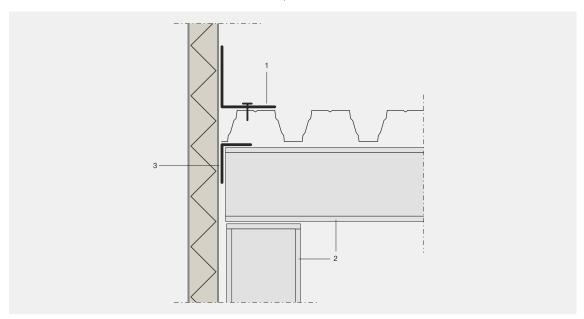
Support steel deck at upstand - 1: L-profile to support insulation | 2: Steel structure | 3: L-profile to support steel deck
